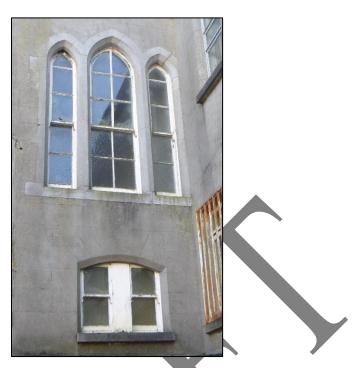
Timber sliding sash windows at stairwell on NW reason vation of convent (05.02.2025).
